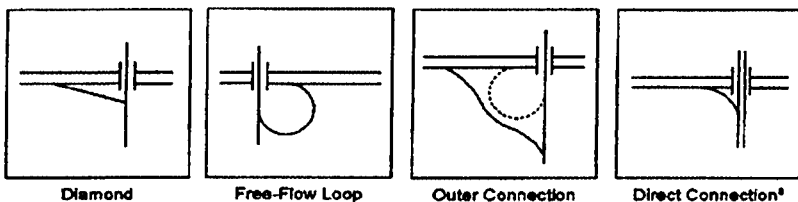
Configuration of ramps. [Source: Bauer and Harwood (1997)]
